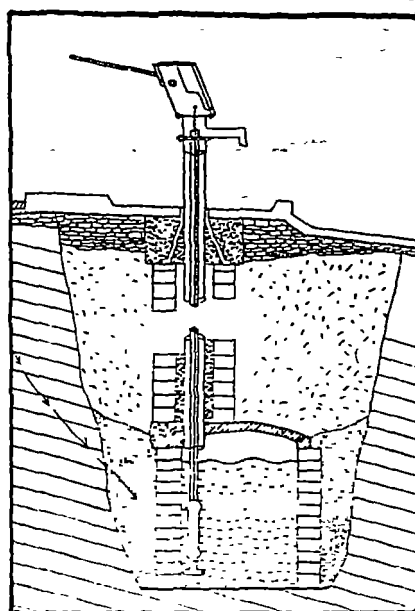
Diagram showing section through a handpump well, with seepage issuing from the left.
